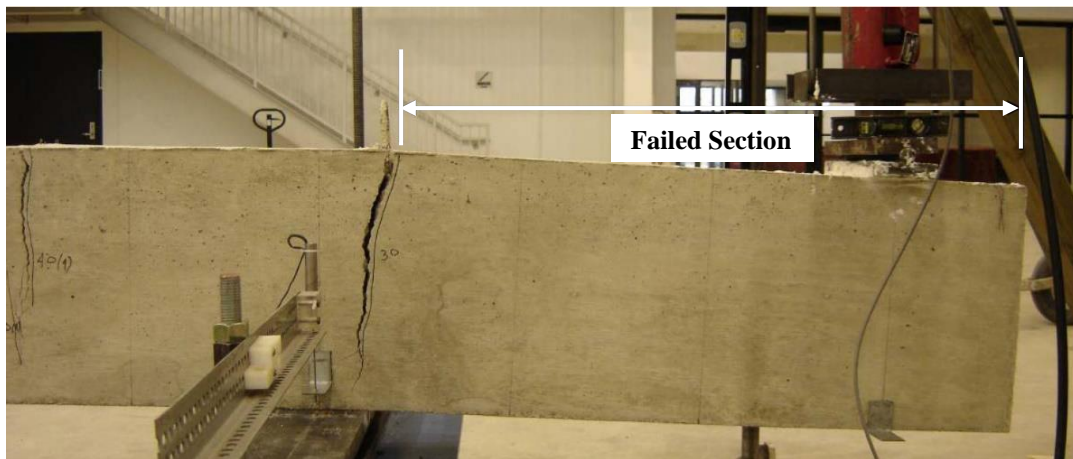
B-PG2-5-24 Bar Pullout Failure (Pay 2005)
